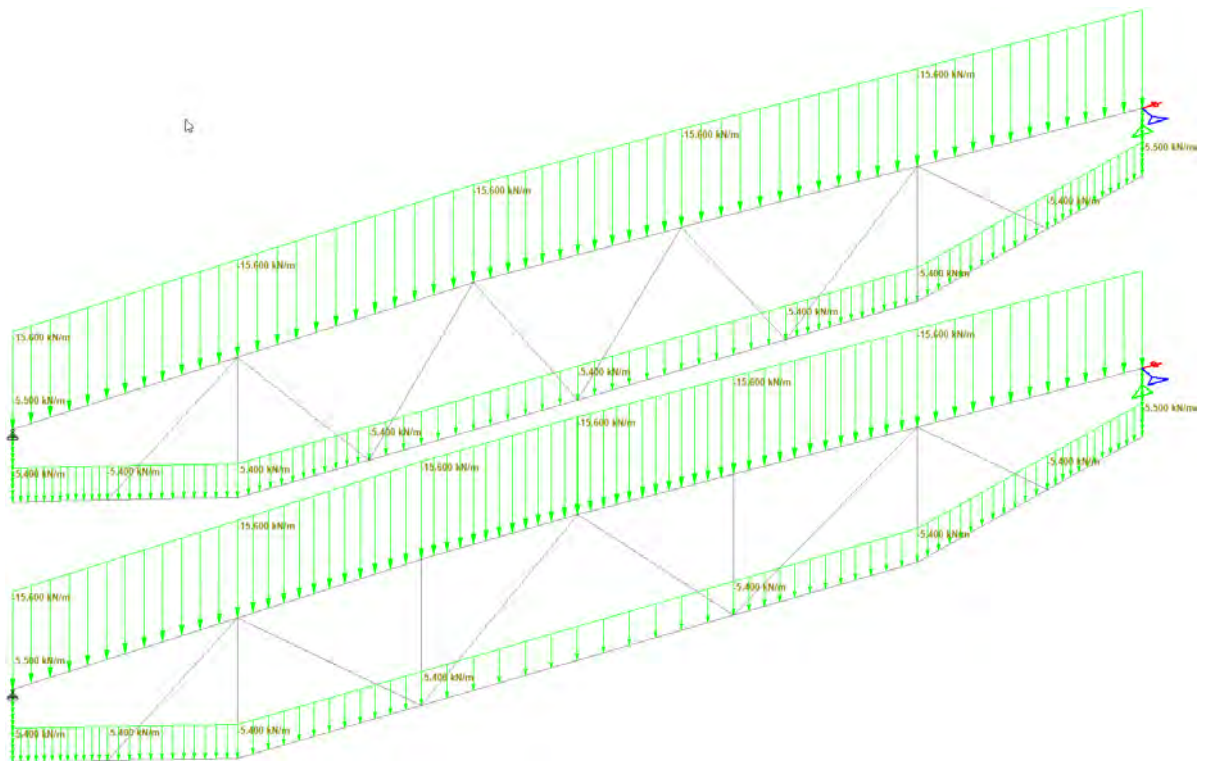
Dead loads of bridge girder. Self-weight of beams is also included.
